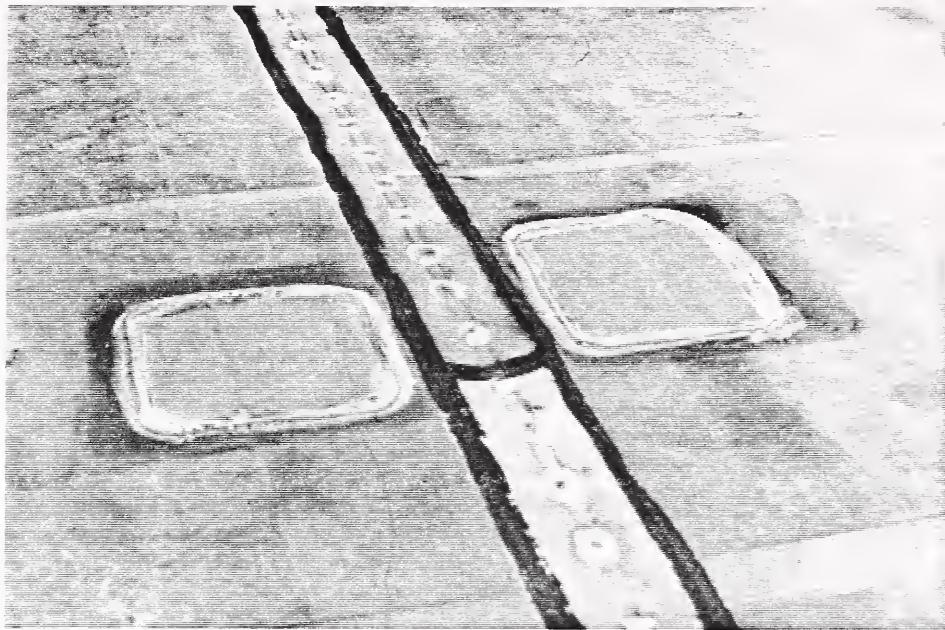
Patches along side of a cover strip over mechanical fasteners; the patches had performed well
